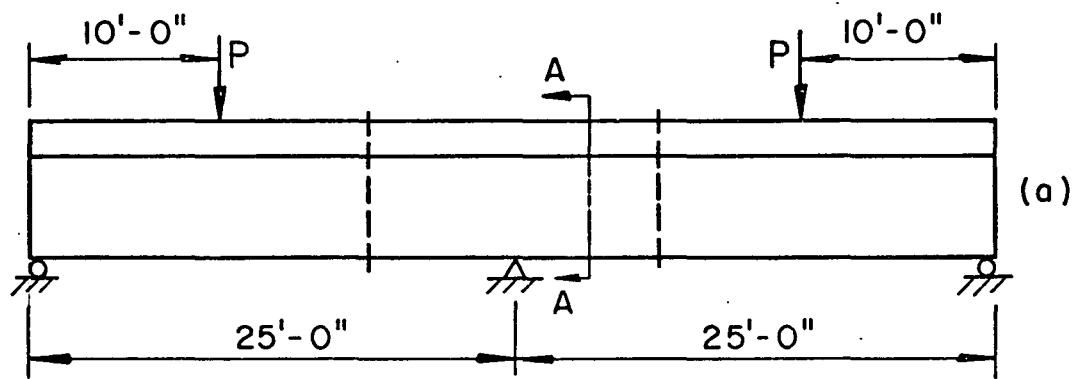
TEST BEAMS PSC-1S AND PSC-2S
